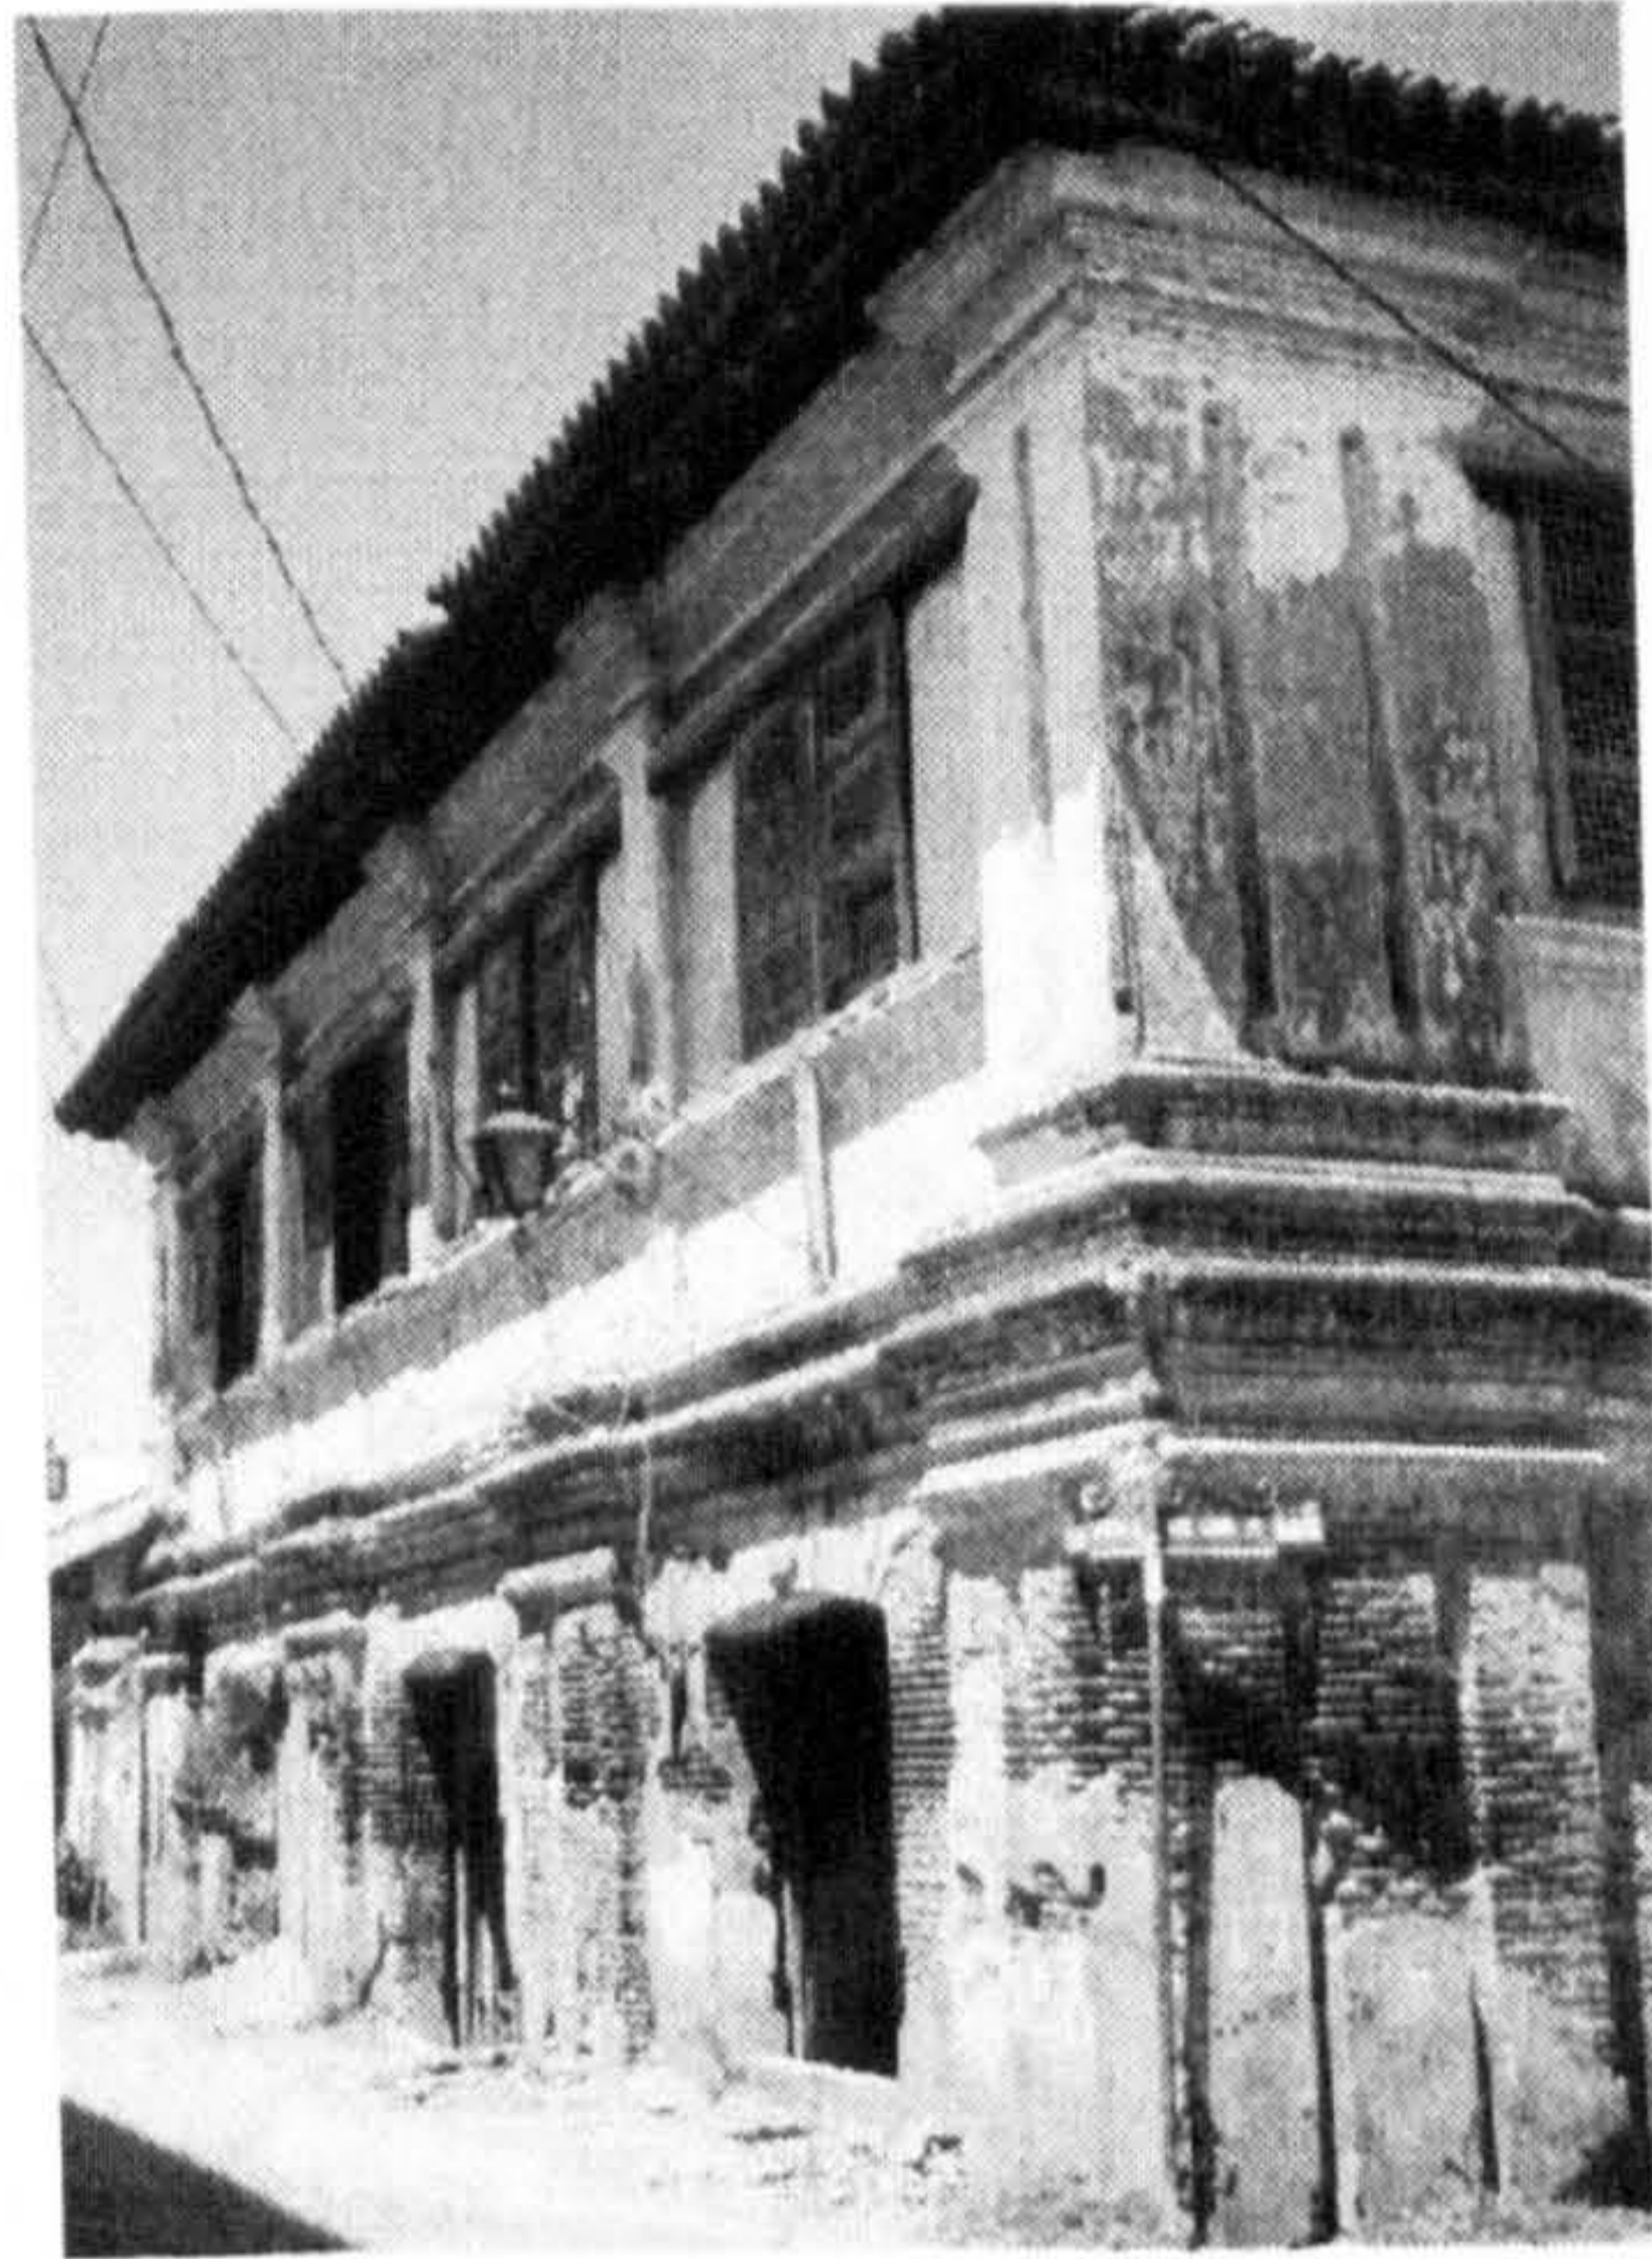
'All-brick' house with thick brick walls extended to the ceiling and are punctuated with deep openings.
